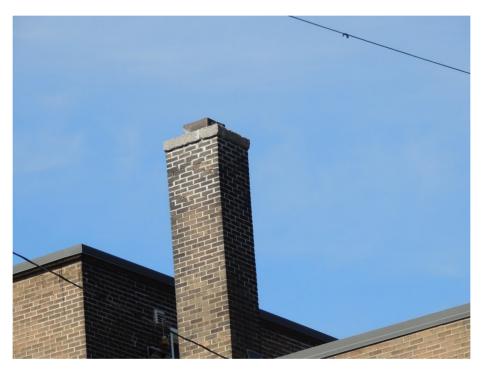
Building at corner of Cambridge Street north and Laurier Avenue West, chimney capped. (Looking east).
